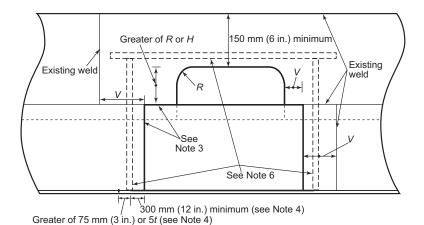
Details for Door Sheets in Riveted Seam Tank
